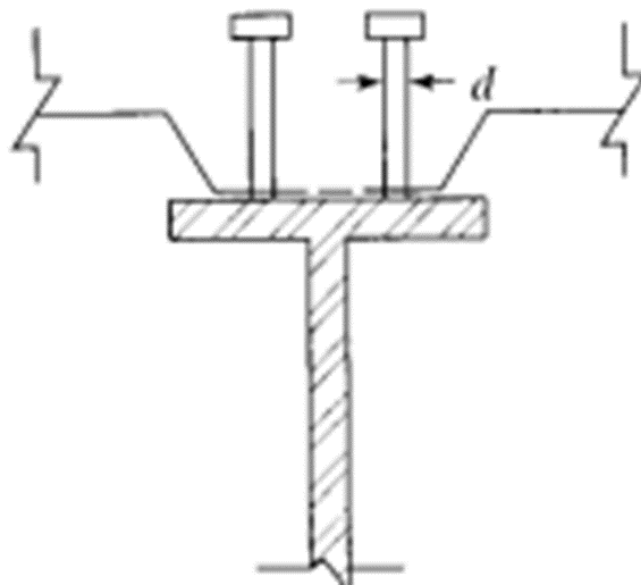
Steel Beam with Shear Studs (*Structural Steel Design*)
